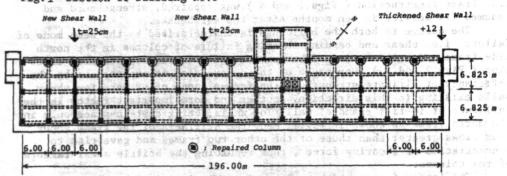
Repaired columns and added shear walls (plan of 3F) steel braces and the existing R.C. frames was secured by a kind of posttentioning technique. Further, the ends of the in-fill spandrel wall were continuously perforated by core boring so that the columns may not encounter any more shear failure.
